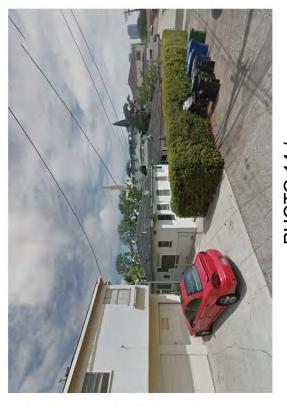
/ EXISTING BUILDING TO BE DEMOLISHED
